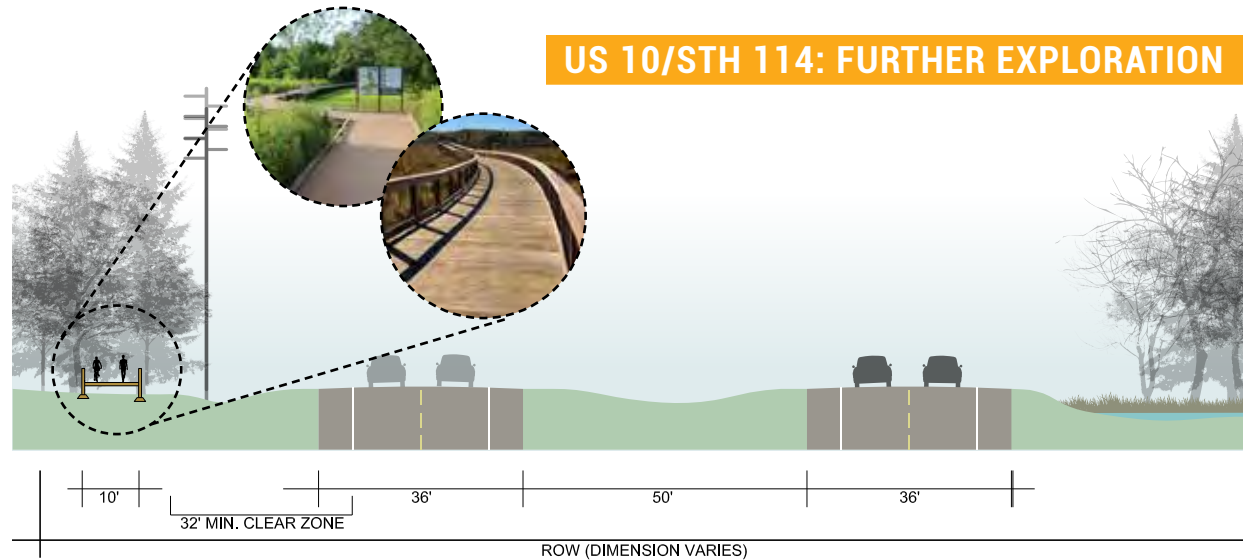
Exploration of future elevated boardwalk along US 10/STH 114 (north side shown; to be determined which side of roadway in final design)
